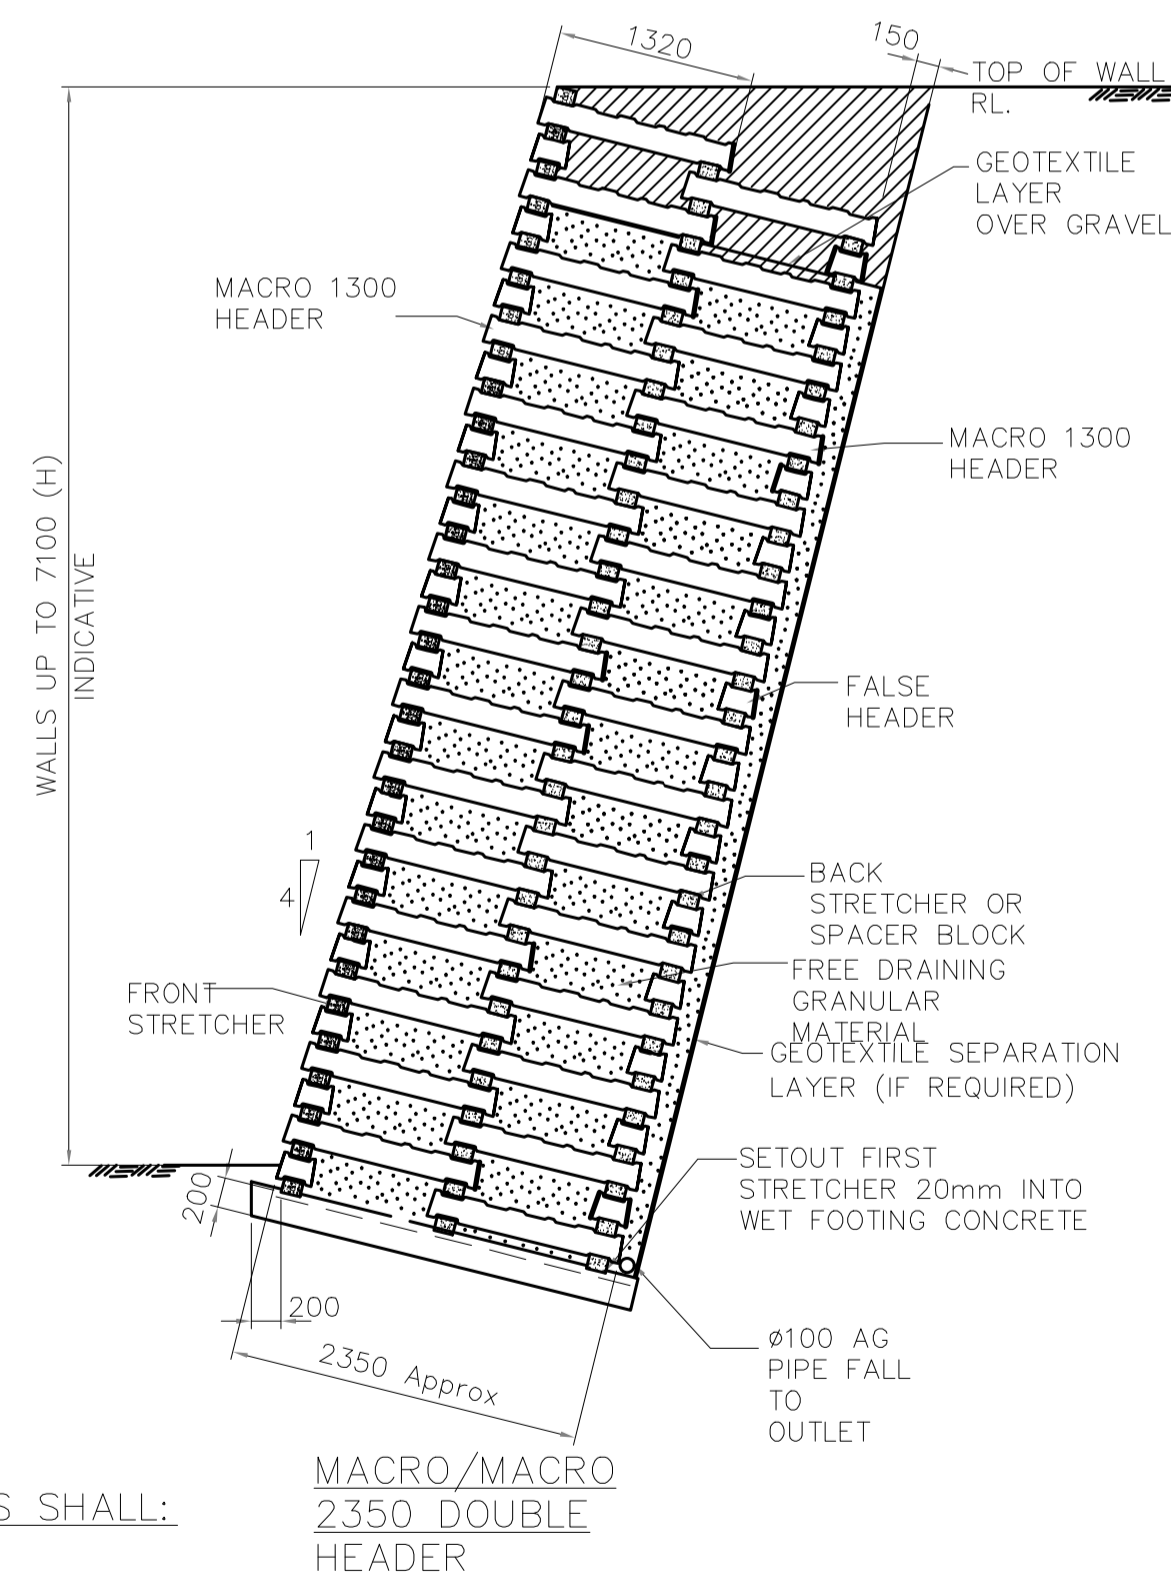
DETAIL OF R/C CONC. CRIB WALL (ALT 2)
